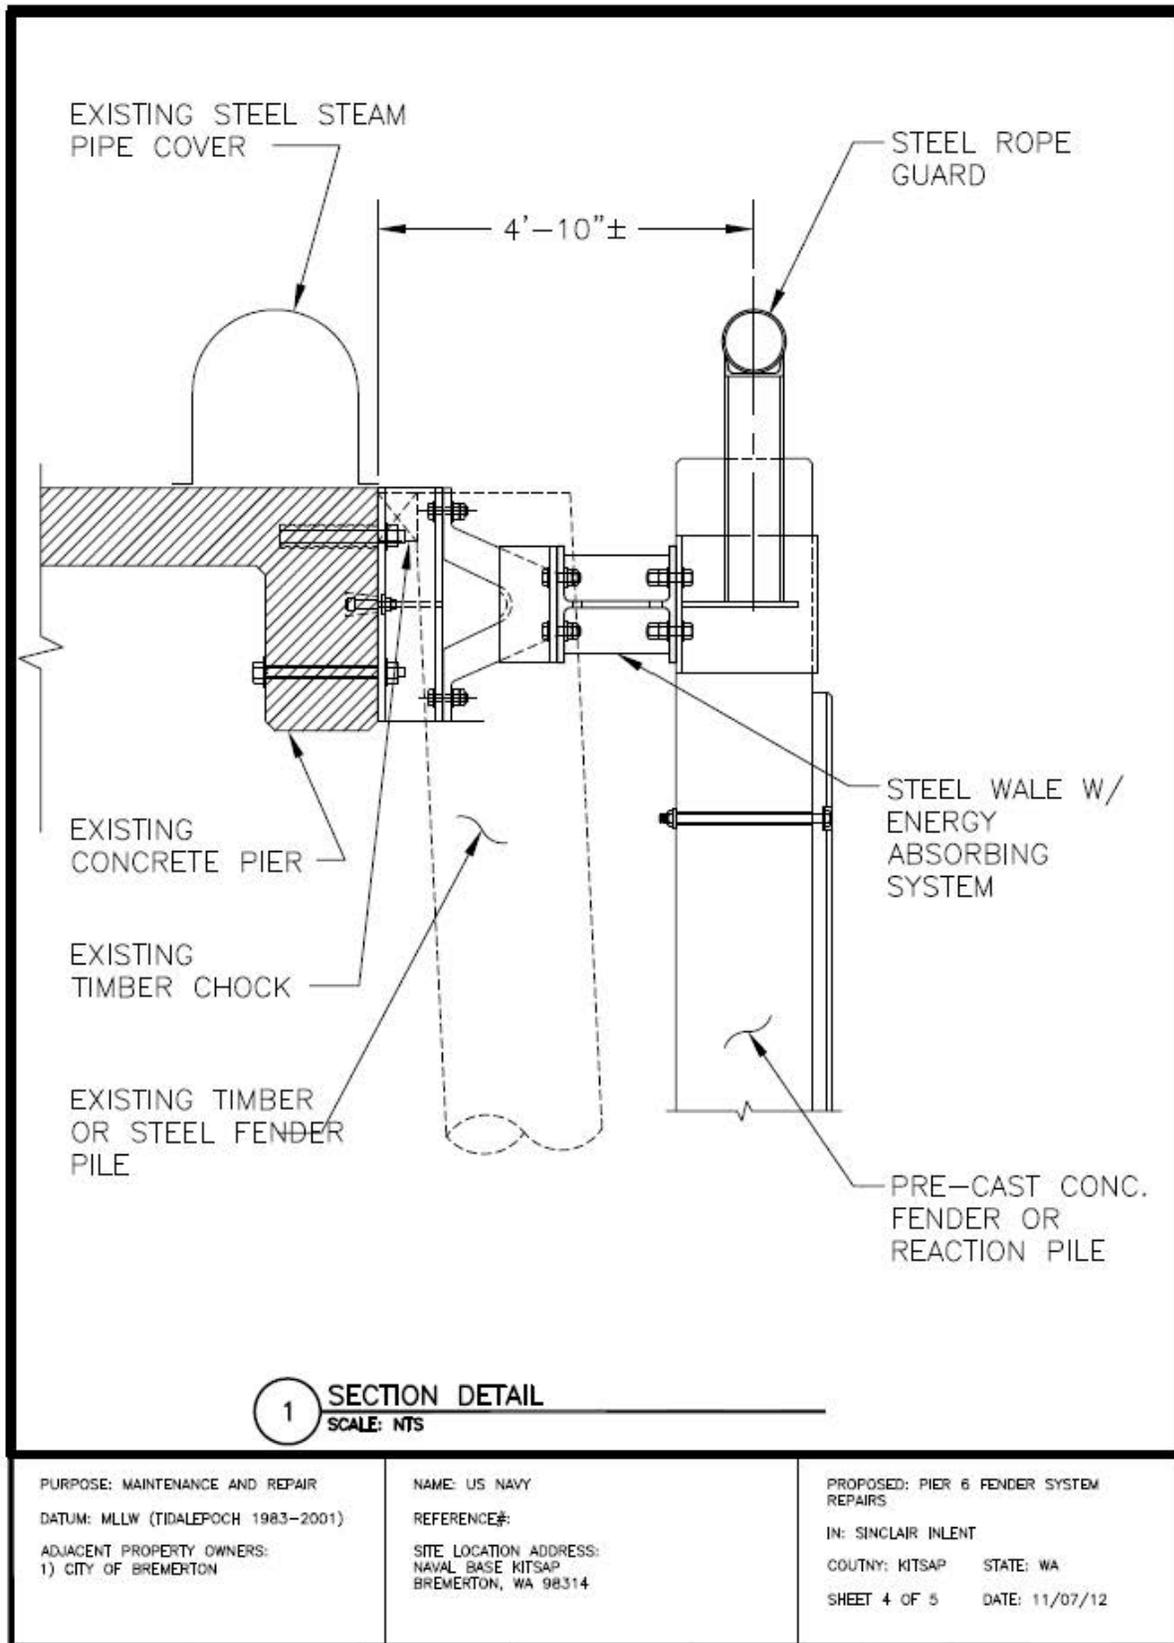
Detail of Deteriorated Fender Piles at Pier 6
